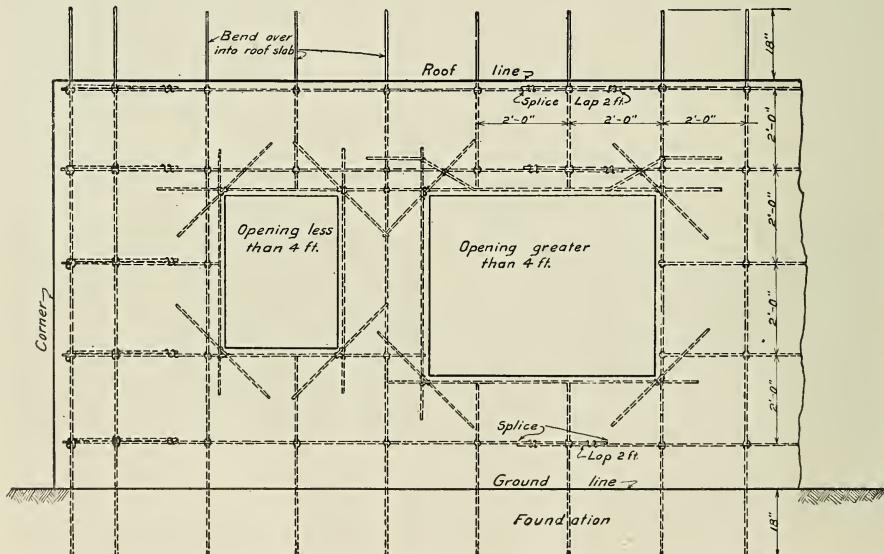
Diagram showing the general scheme for reinforcing monolithic walls for small buildings limited to one story in height.
